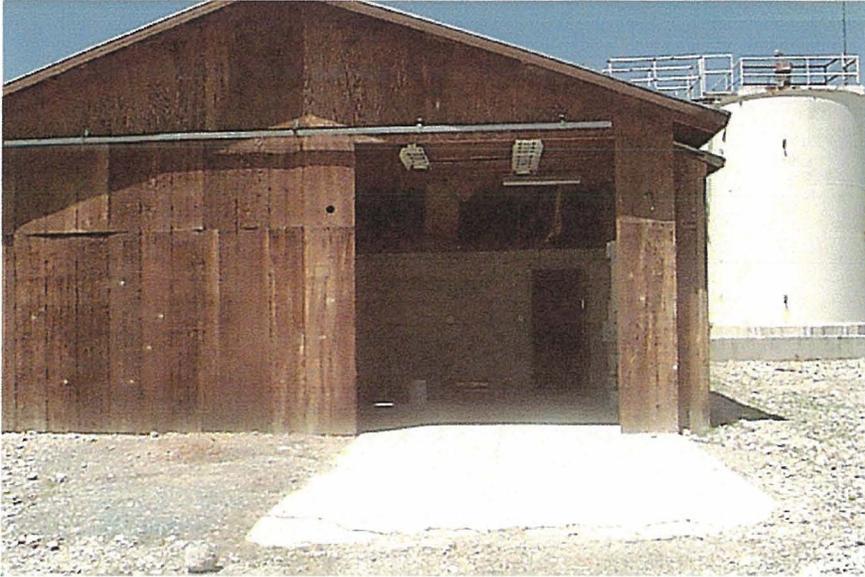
Taken by E. Seum on 5/13/99. Looking north at small building on the Advance #5 mill site. Building is open.
